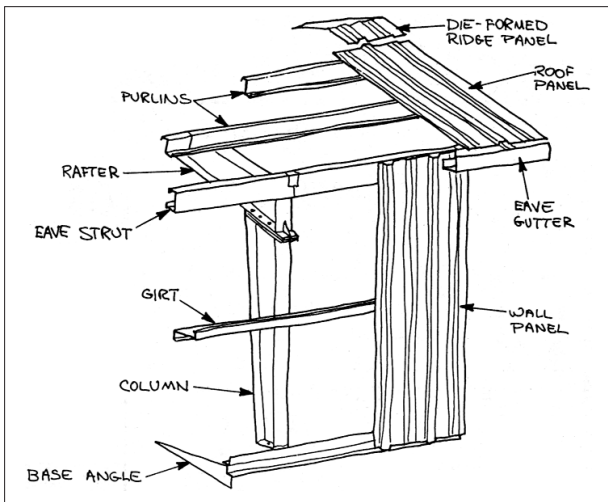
On a rigid-frame building, girts, eave struts, and purlins tie the individual frames together and provide support for roofing and siding.
